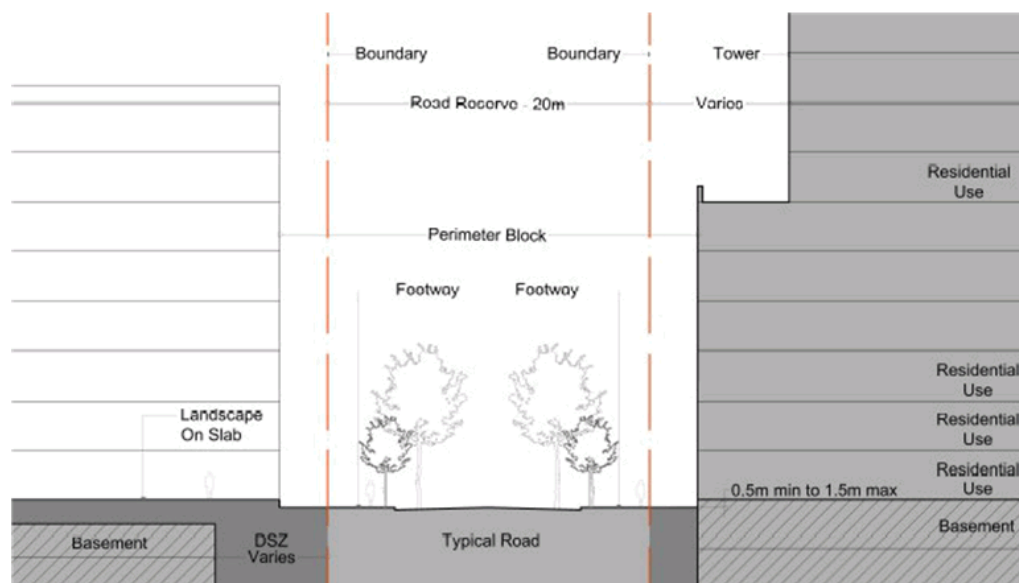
Courtyard Basement – Interface with Street
